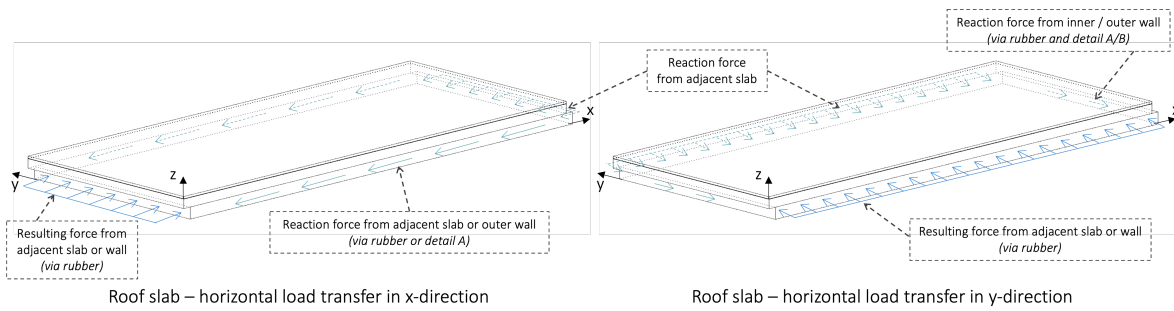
Horizontal load transfer in a roof slab in x- and in y-direction
